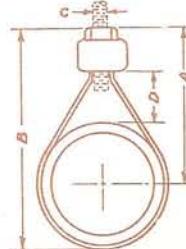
CT bands can be assembled while the pipe line is in place. Rod 'C' must be threaded through the nut in order to support the load.
